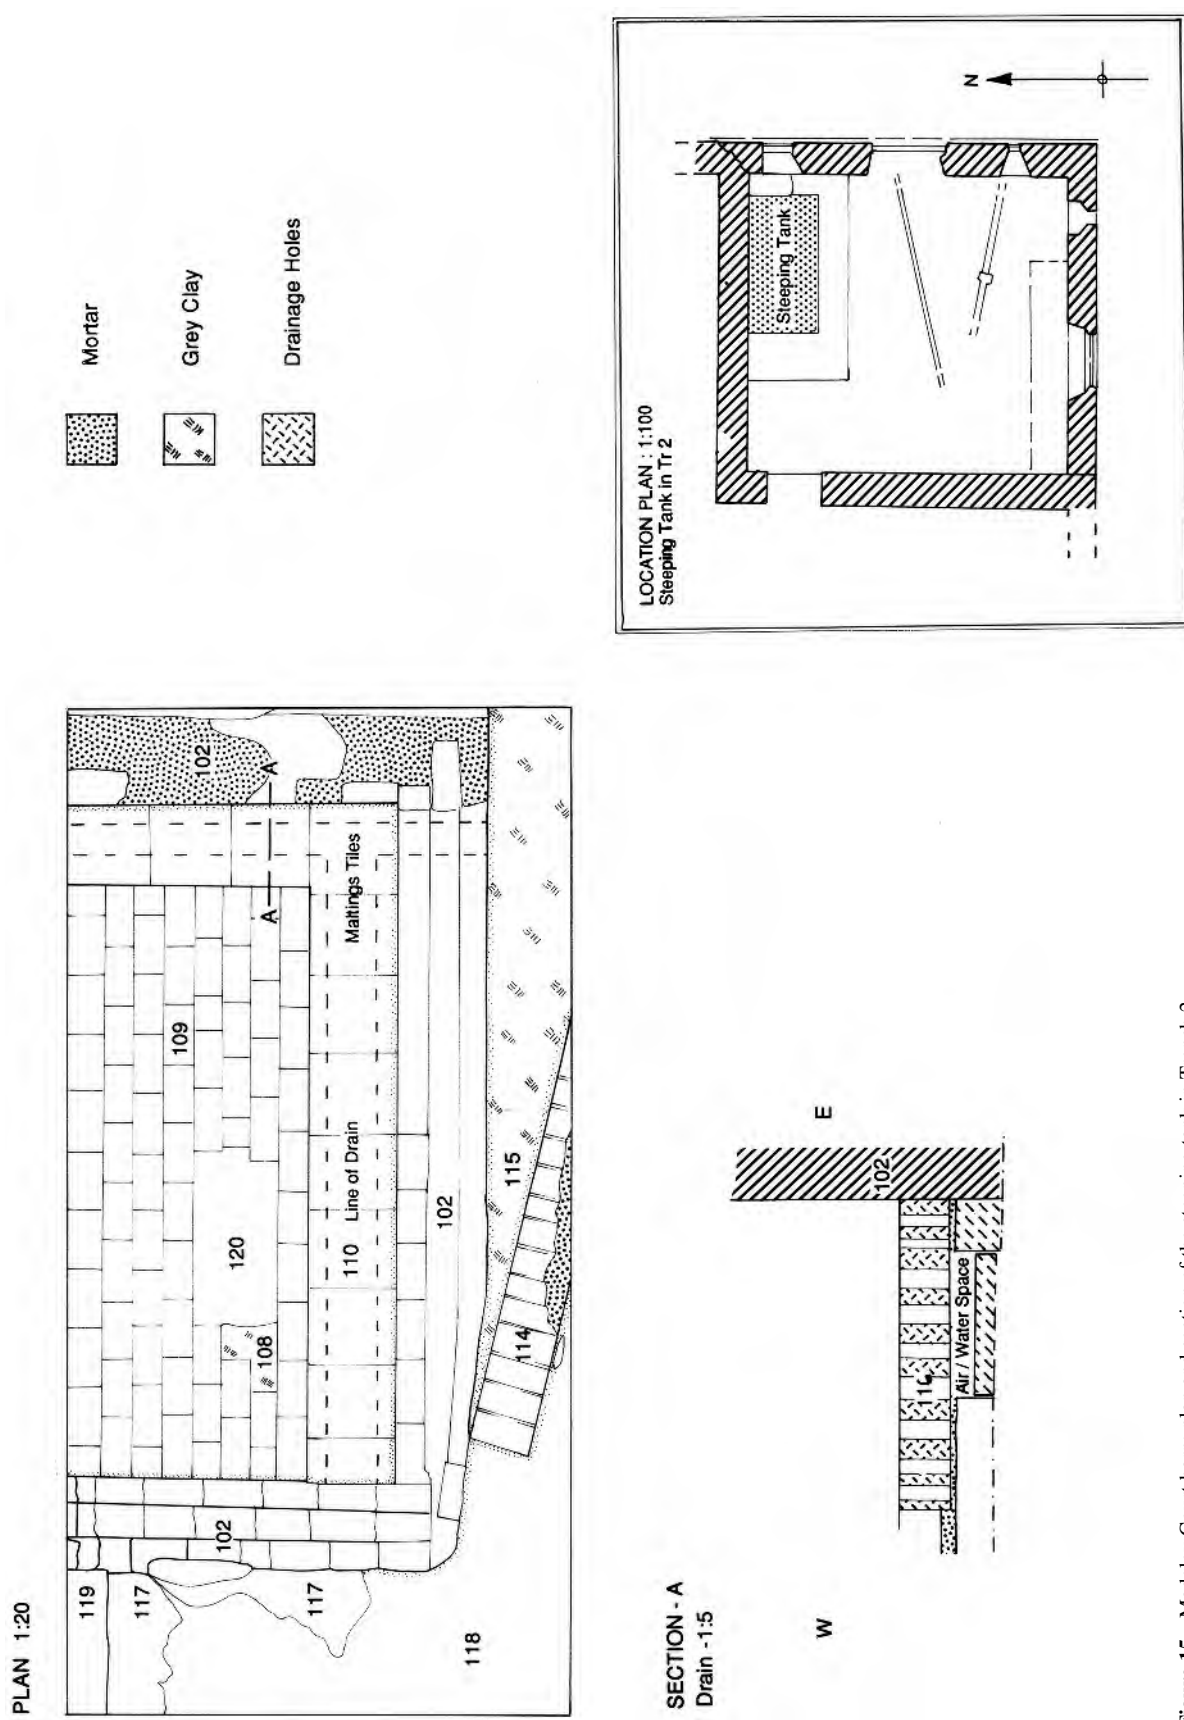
Madeley Court barn: plan and section of the sleeping tank in Trench 2.
